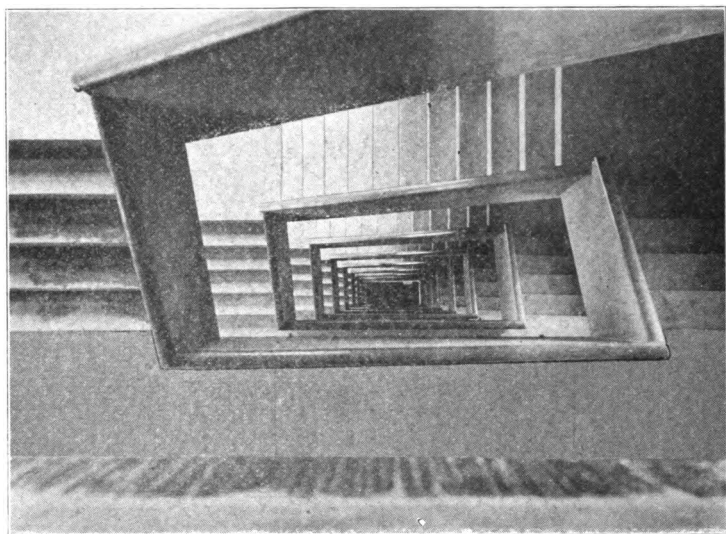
Looking down 10 Flights of Stairs, Power Building, Cincinnati, O.
